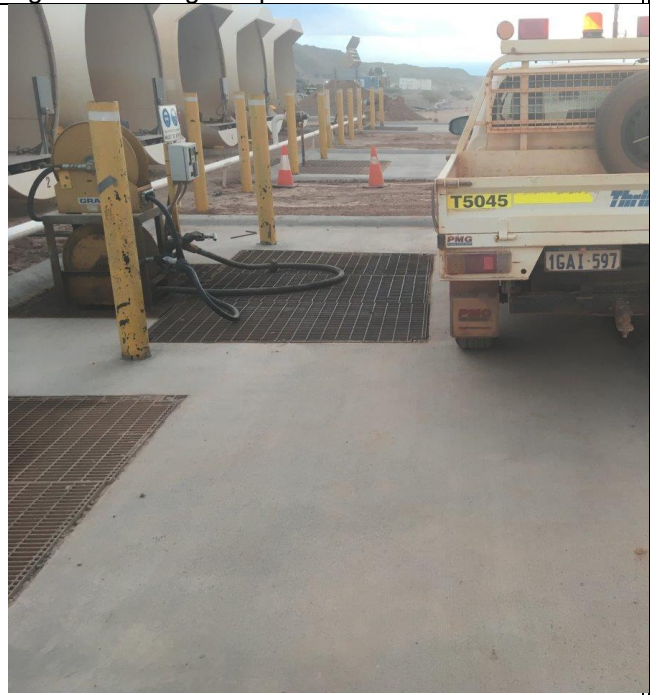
Impermeable concrete bunding installed at all three fill-up points at fuel farm.
